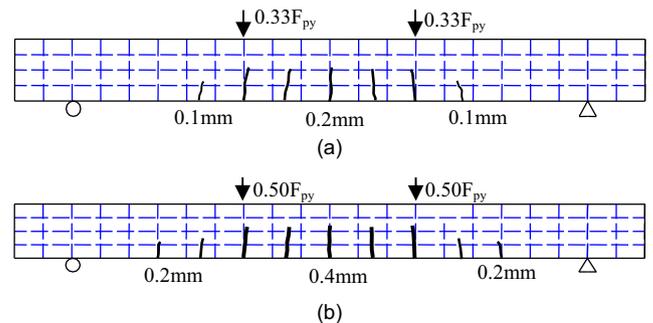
Crack patterns for specimens of Group A (At the concrete age of 150 days) (a) Specimen A-33-00 (b) Specimen A-50-00.
